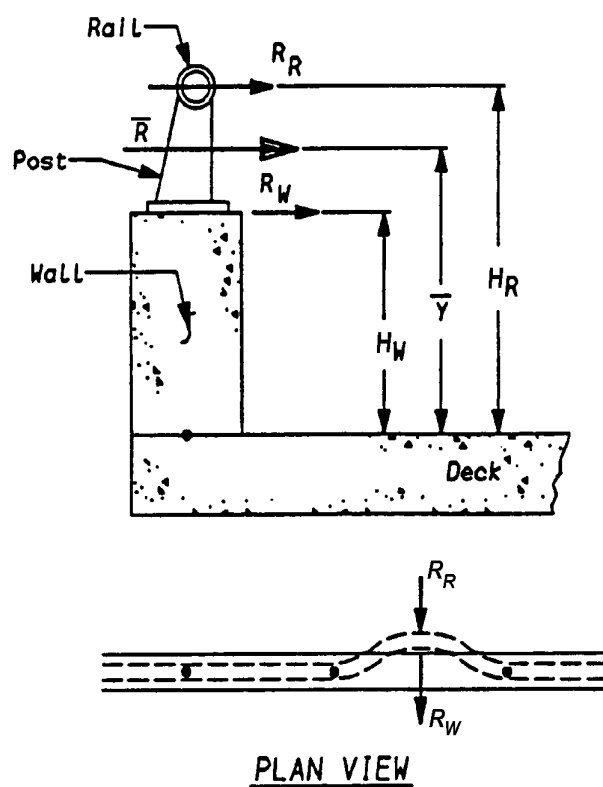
Concrete Wall and Metal Rail Evaluation—Impact at Midspan of Rail
